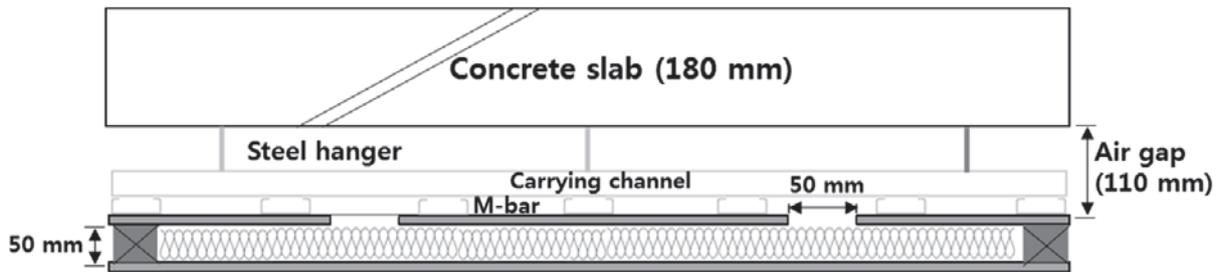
Structure of the suspended ceiling with resonant panel absorber
